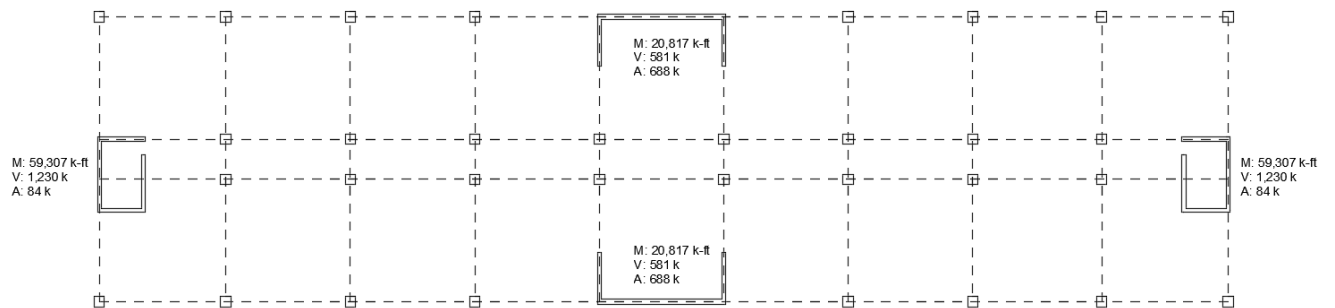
ETABS output of axial load, shear force and bending moment at the base of each structural wall ground floor
